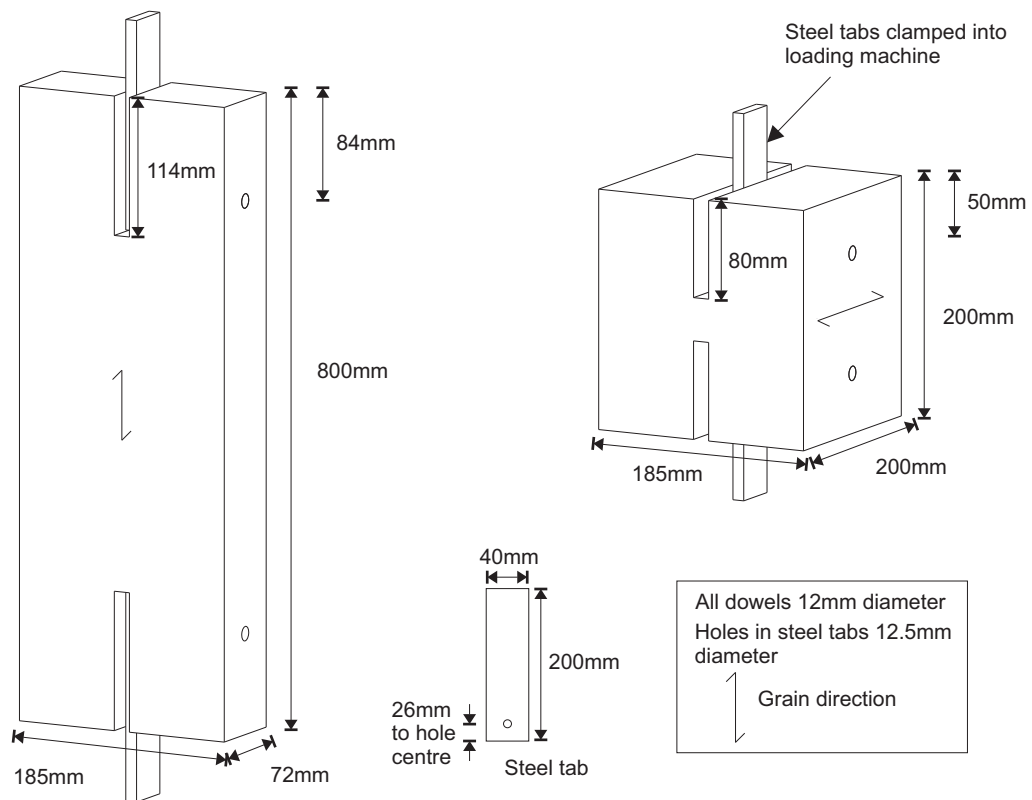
Test setup and specimen dimensions for single-dowel connection tests
